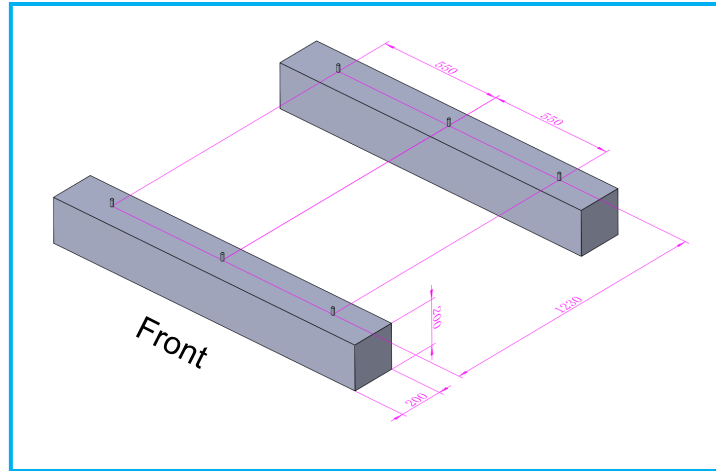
Mounting hole dimensions of AiO Box (unit: mm)
